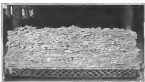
Plate VI Duralumin floor roadway with corrugated metal surface under static test of 300 lb. per sq. ft.
